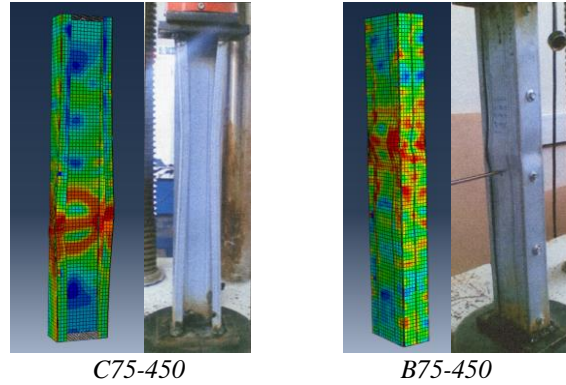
Failure mode of FE models and tested specimens of stub columns.
